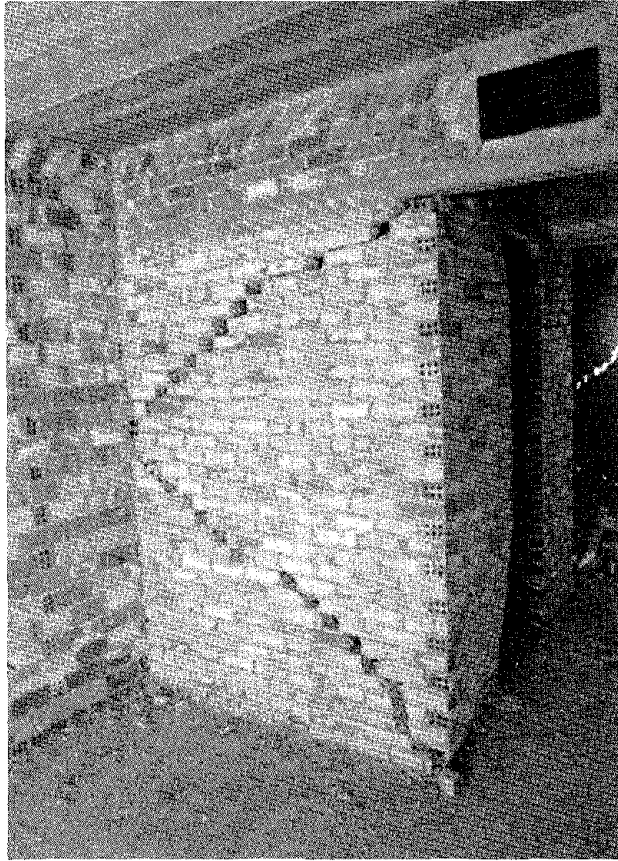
Hollow-brick wall with a reinforced concrete beam at the midheight of the story.
